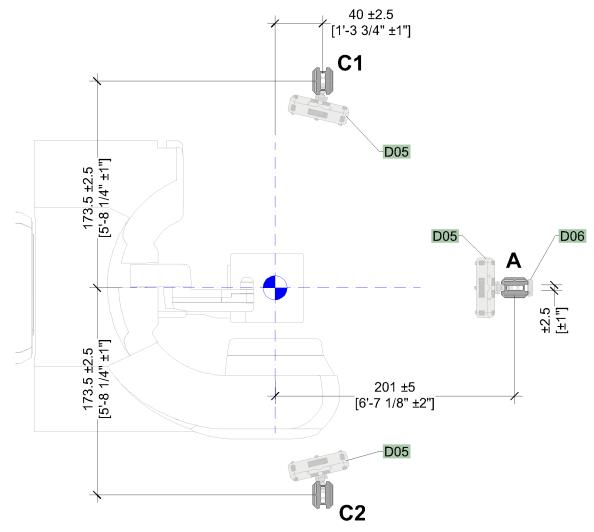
TrueBeam GCX Ceiling Plate Positions
